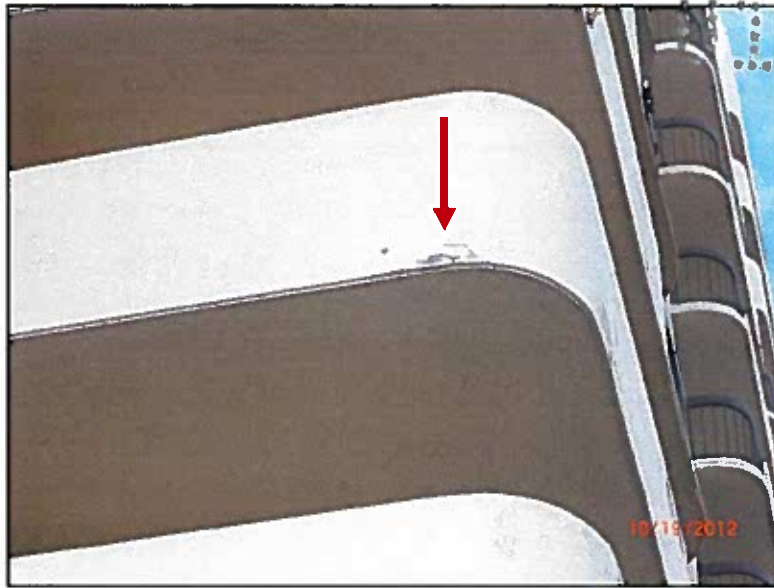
cracking and staining at bottom of fourth floor balcony wall on east
